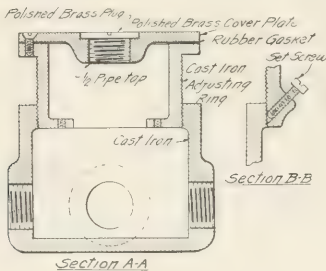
DETAIL OF SMALL FLOOR OUTLET BOX FOR DESK-LIGHTING, TELEPHONES, CALL BELLS, ETC.
